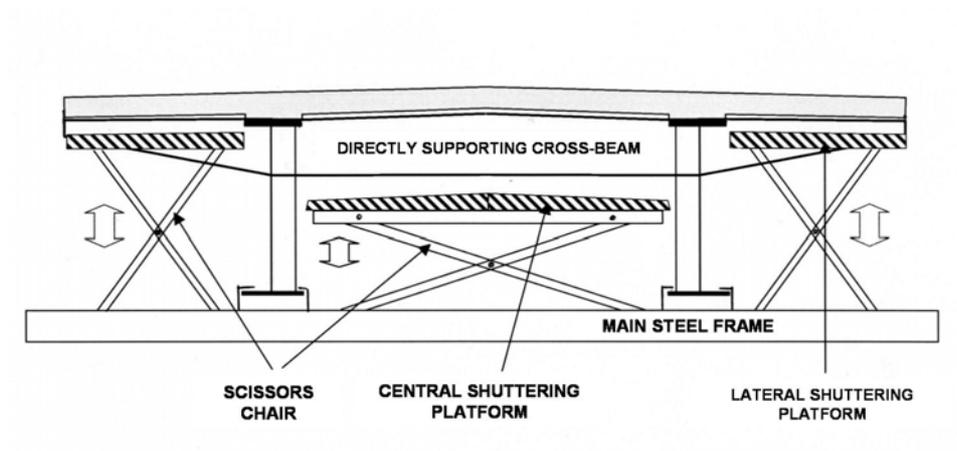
Mobile formwork for a deck incorporating directly supporting cross-beams with cantilevers / Example 2
